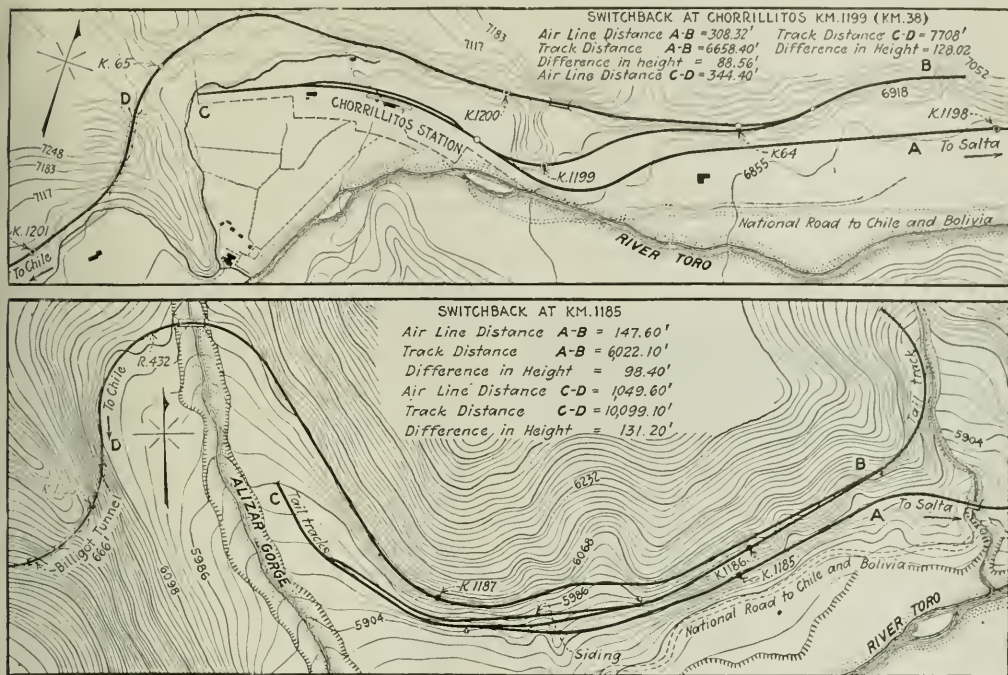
SWITCHBACKS ON NEW TRANSANDINE RAILWAY
